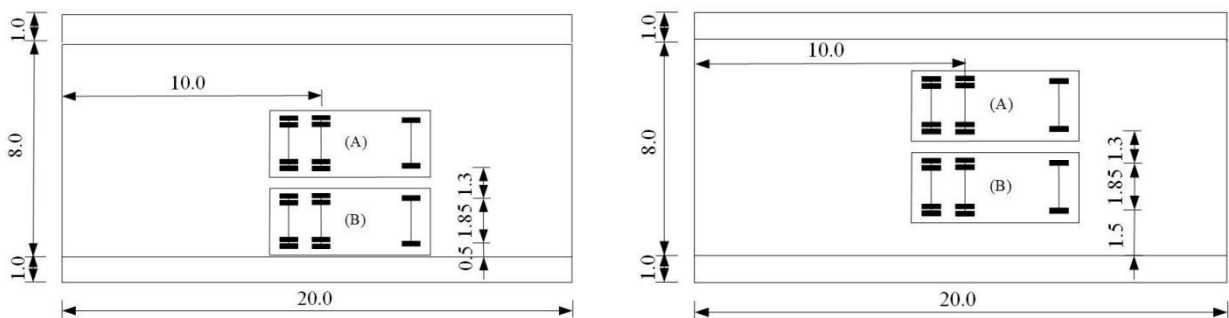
Load cross-sectional view of bridge two (Unit:m)
